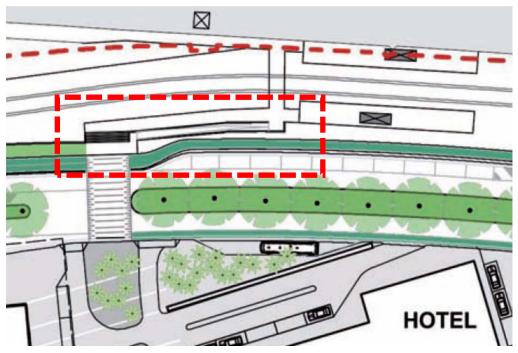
Pedestrian stair from Convention Light Rail Source: City of Sydney
